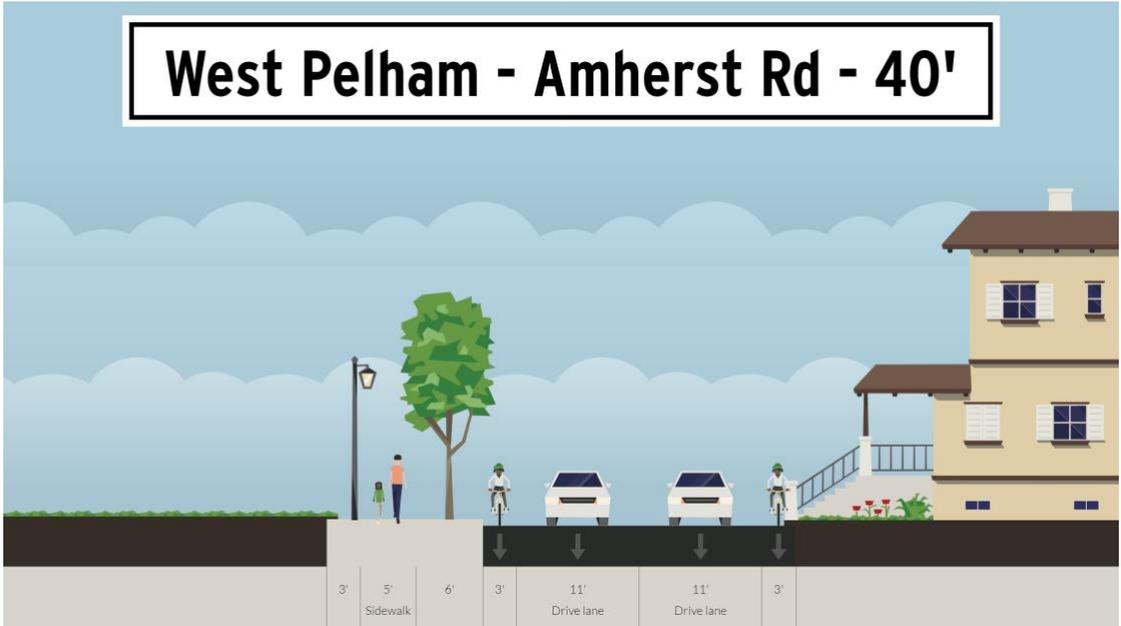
Sidewalks, Street Trees, Shoulders for Bikes
